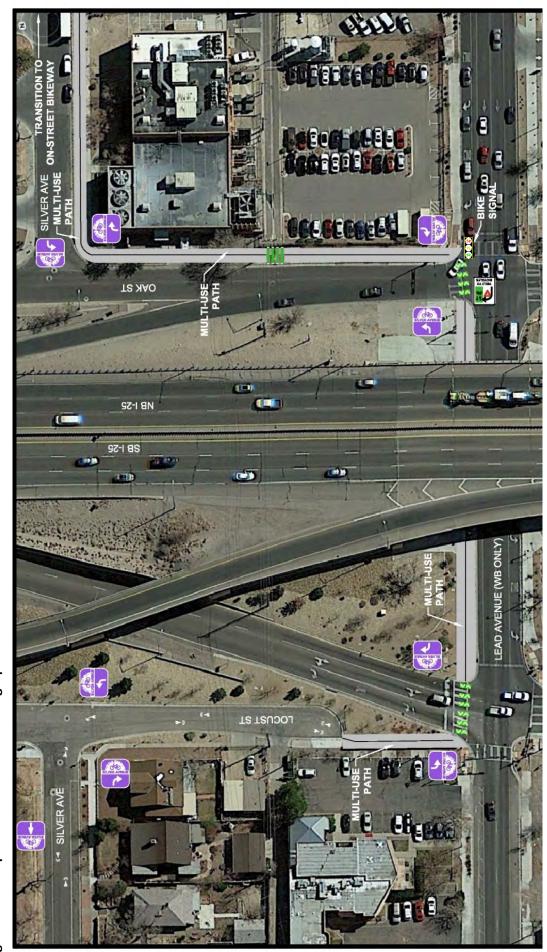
Concept Plan View of I-25 Crossing Option 3 - Multi-use Path Connection under I-25
